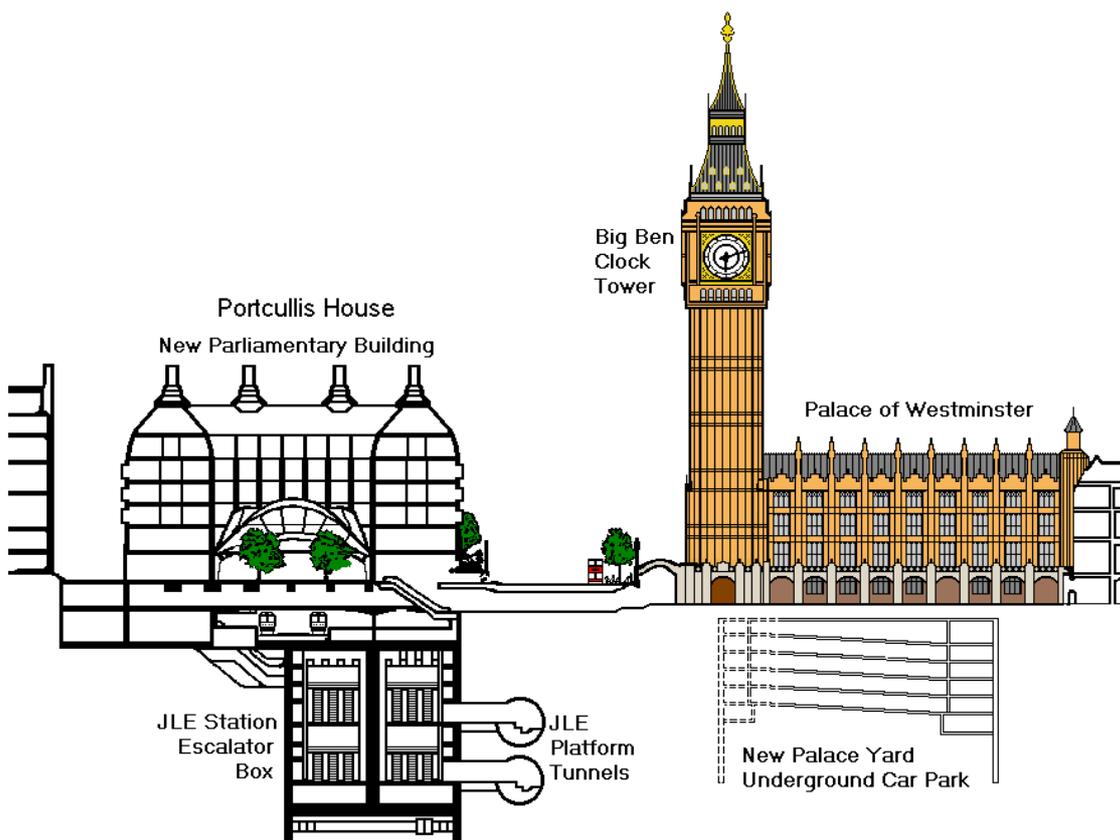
Cross section of the platform tunnels and the underground Westminster Station next to the Big Ben Clock Tower (after Burland et al, 2001).
